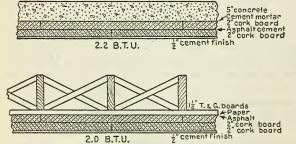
Typical ceiling construction for cold-storage rooms, and the coefficient of heat transfer in British thermal units
